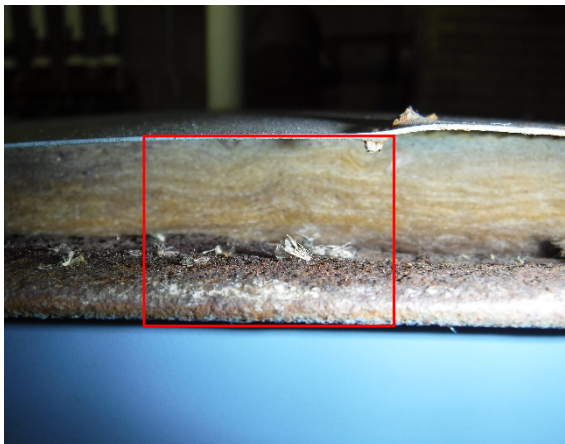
Example Photo of Non-Hazardous Fiberglass Insulation in Boilers – Mechanical Room.
